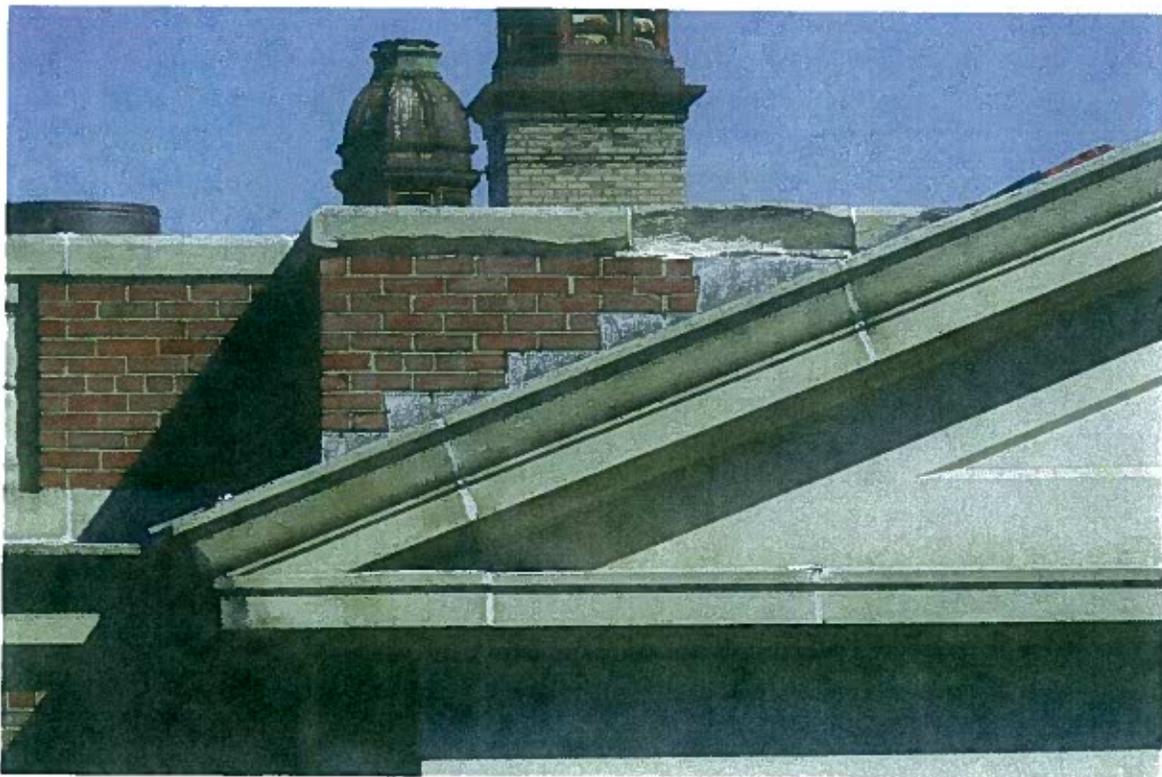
Severe spalling at Indiana limestone parapet coping and damage to brick below.
